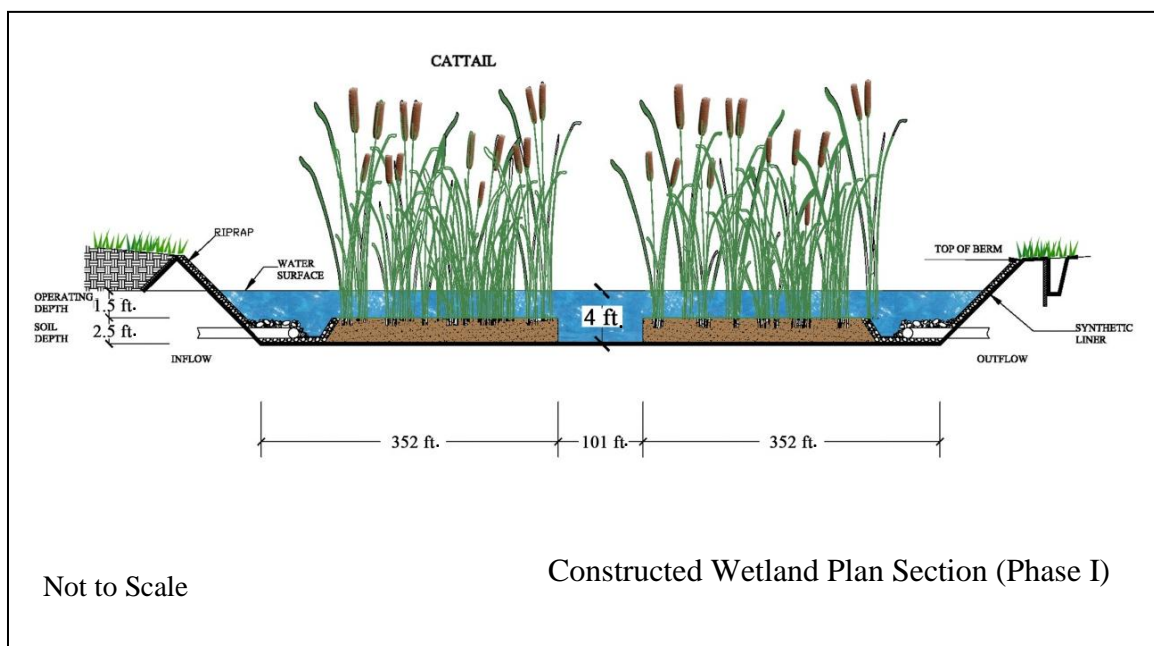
Plan section of the proposed constructed wetland based on current sewage volume.
